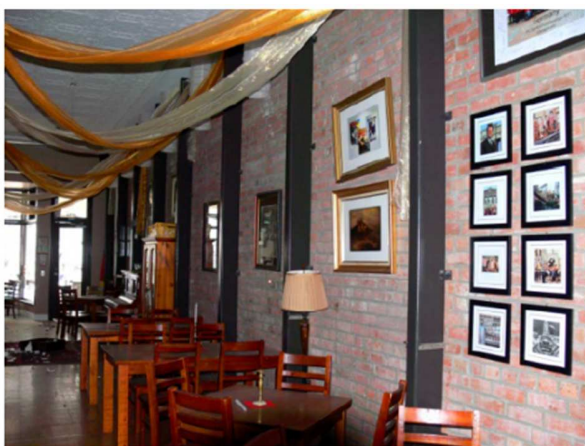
Internal vertical steel elements to restrain out-of-plane wall failure
